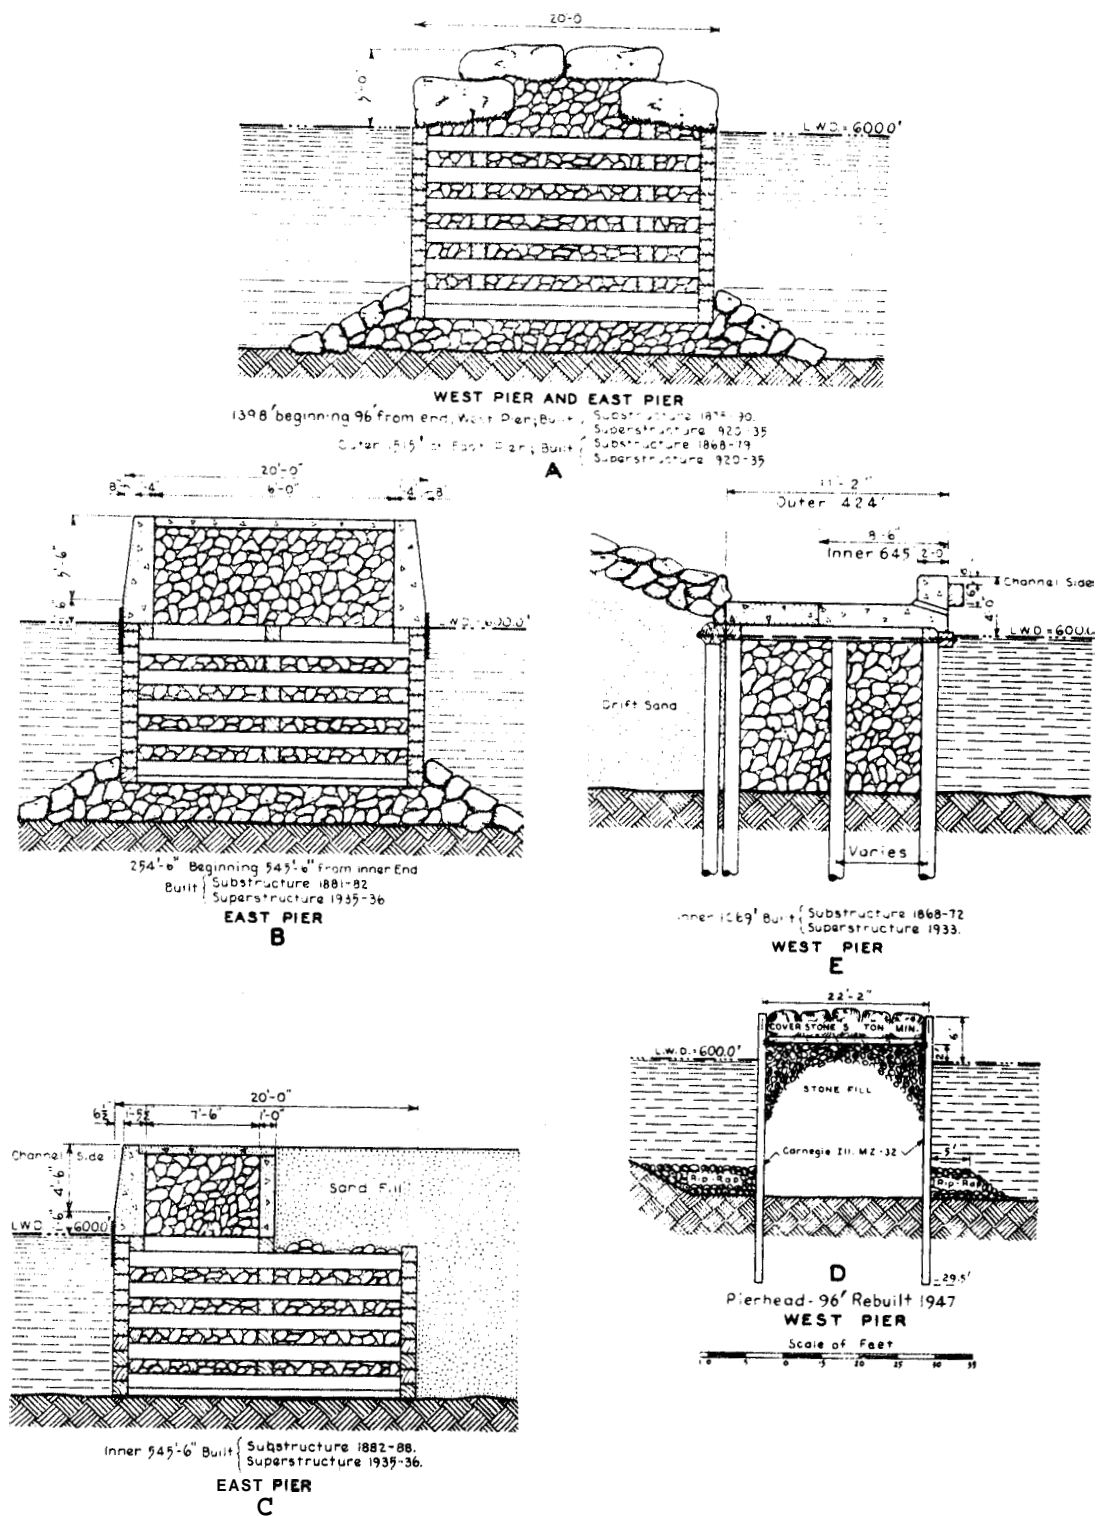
Typical pier cross sections, Ontonagon Harbor, Michigan
